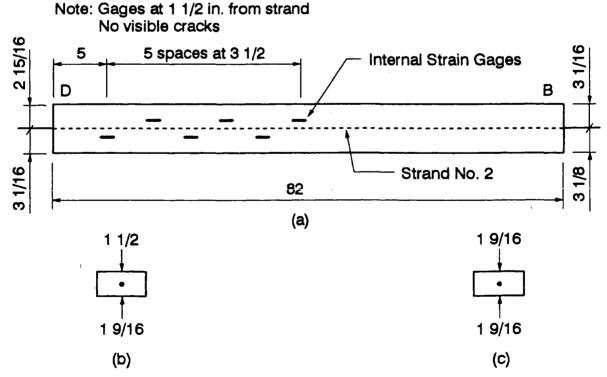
Specimen No. 17-3.0TC-6 (dimensions shown in inches):
